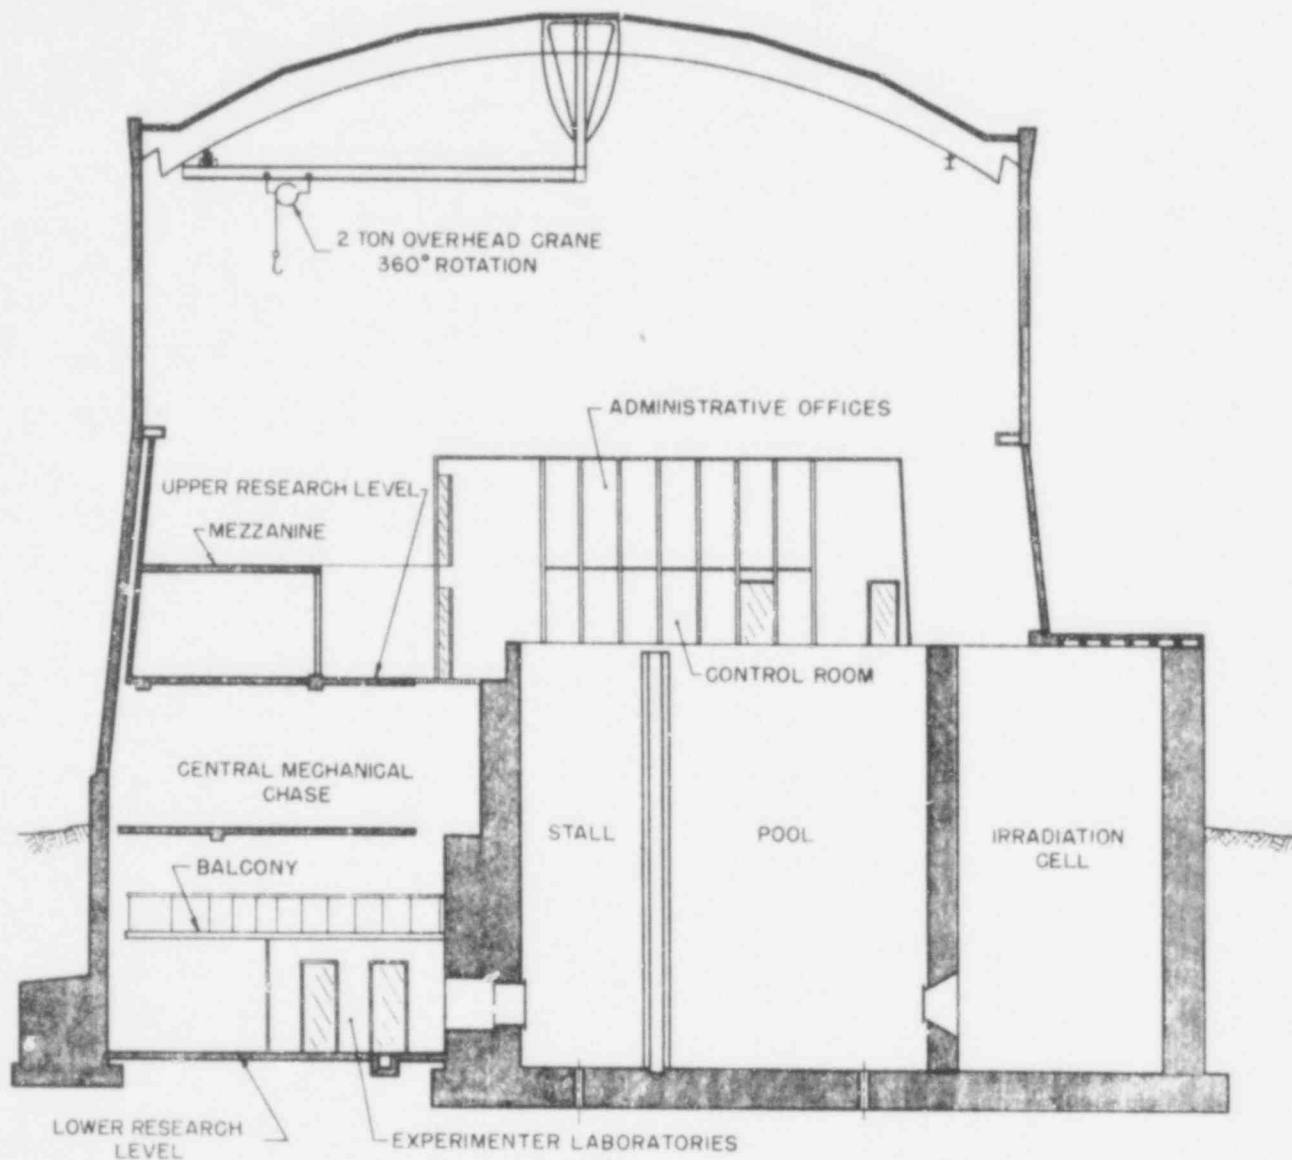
NSCR BUILDING CROSS SECTION
